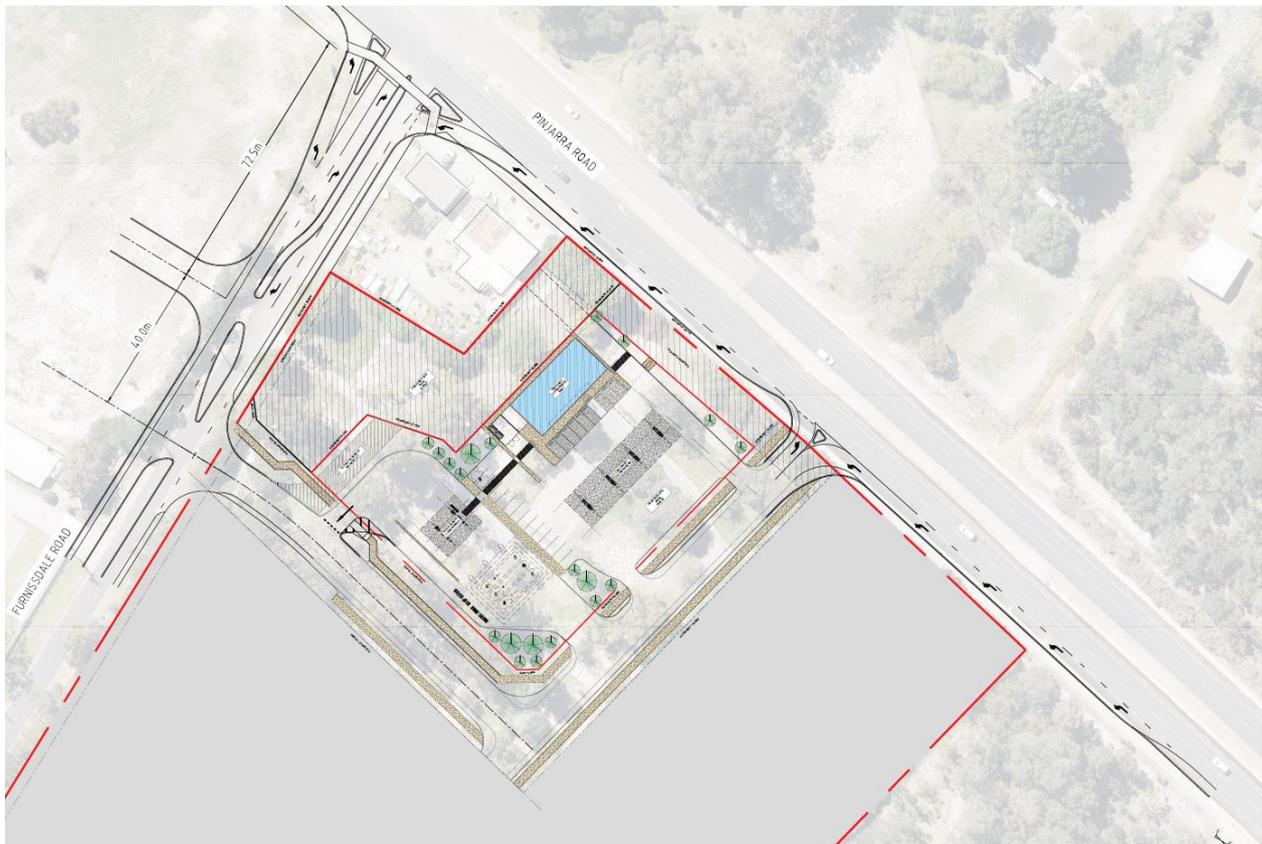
Indicative Future Layout along Furnissdale Road and Pinjarra Road
